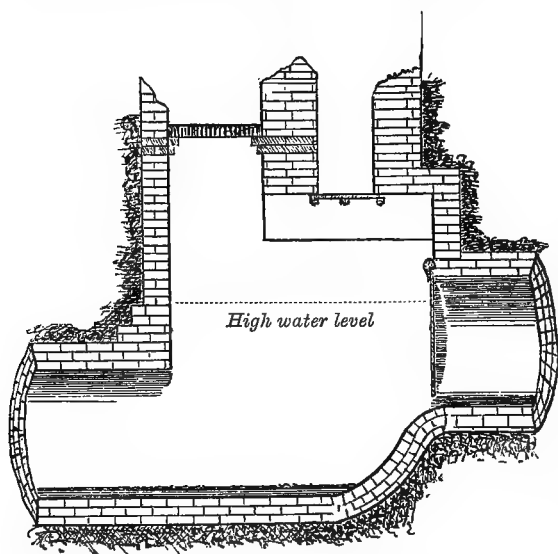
Brick sewer with tumbling bay and connection with ventilating manhole.
